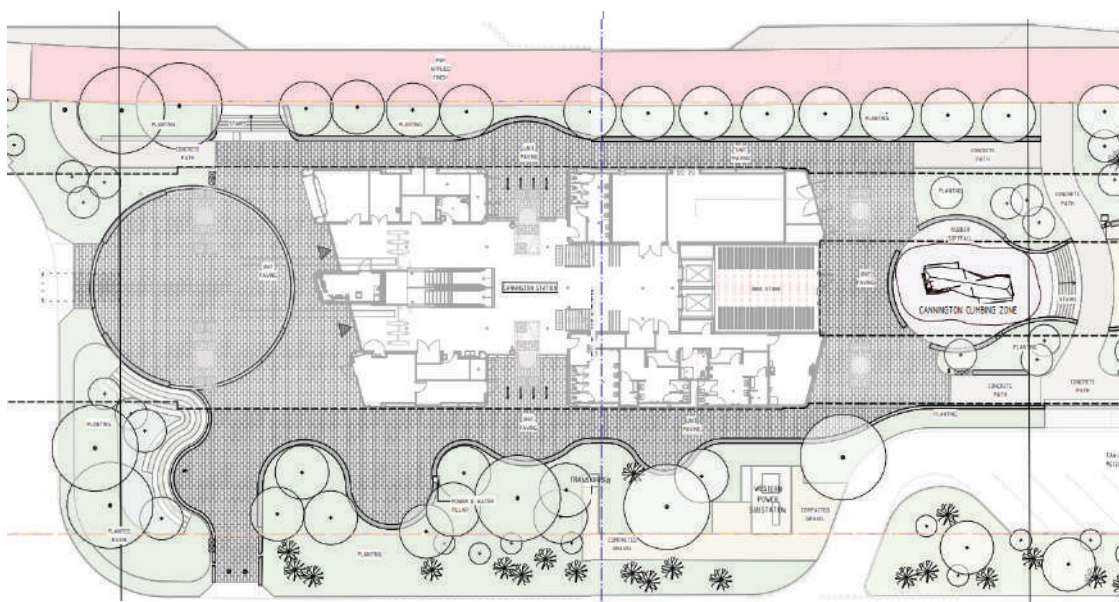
Cannington Train Station, Forecourt and Plaza General Arrangement Plan
